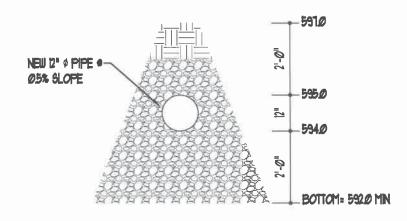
EXISTING OUTLET PIPE ELEVATION DETAIL
